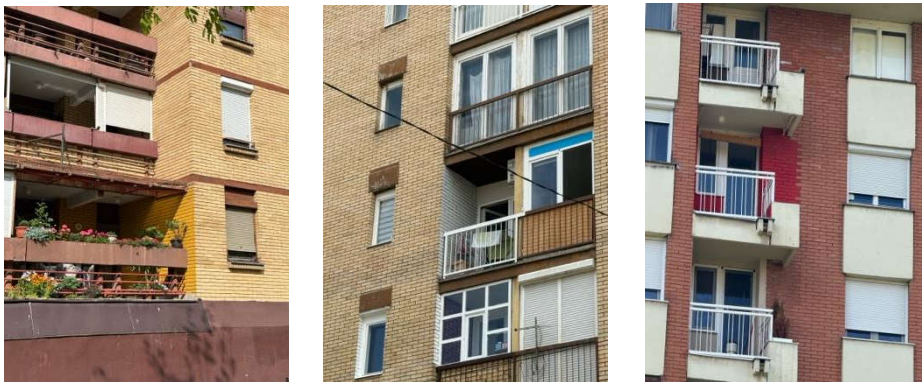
Examples of painting activities on the façades in apartment buildings in Niš, source: B. Stojković
